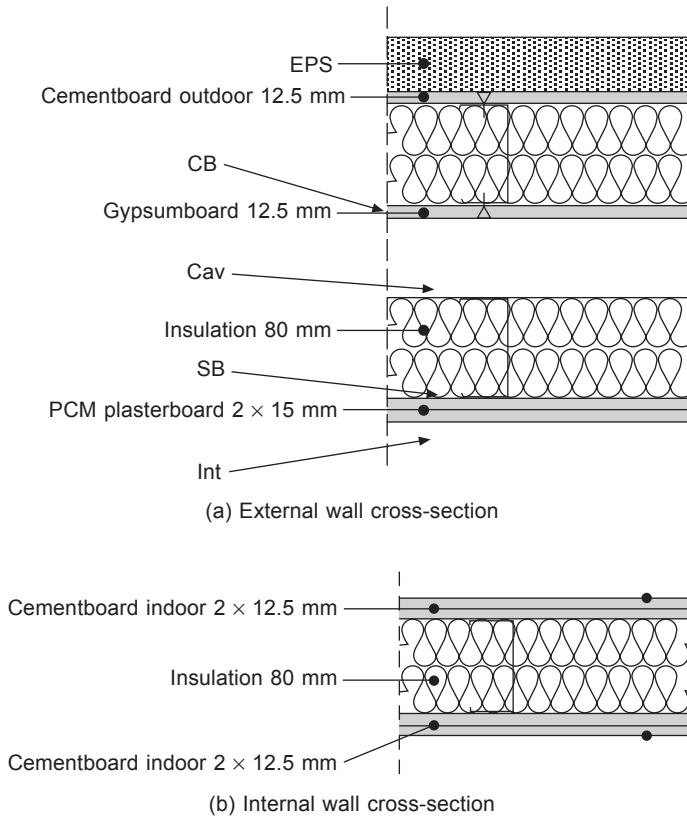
Sketch of: (a) the external wall ('CB', 'Cav', 'SB', 'Int' correspond to temperature sensors placed in the LVR east wall); (b) the partition wall with cement boards (Mandilaras *et al.*, 2013).
